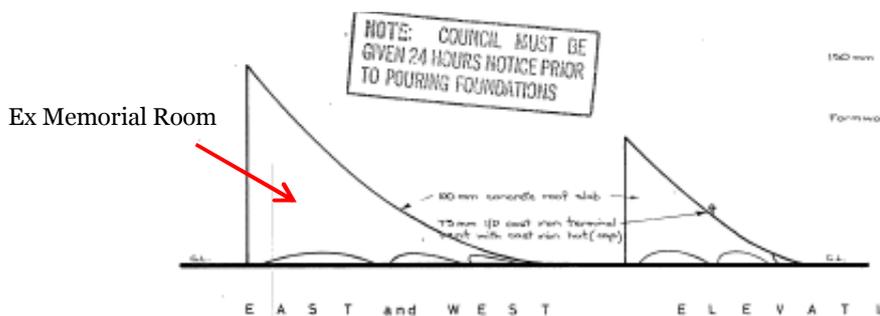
Side elevation of the Ex Memorial Room and public toilets.
